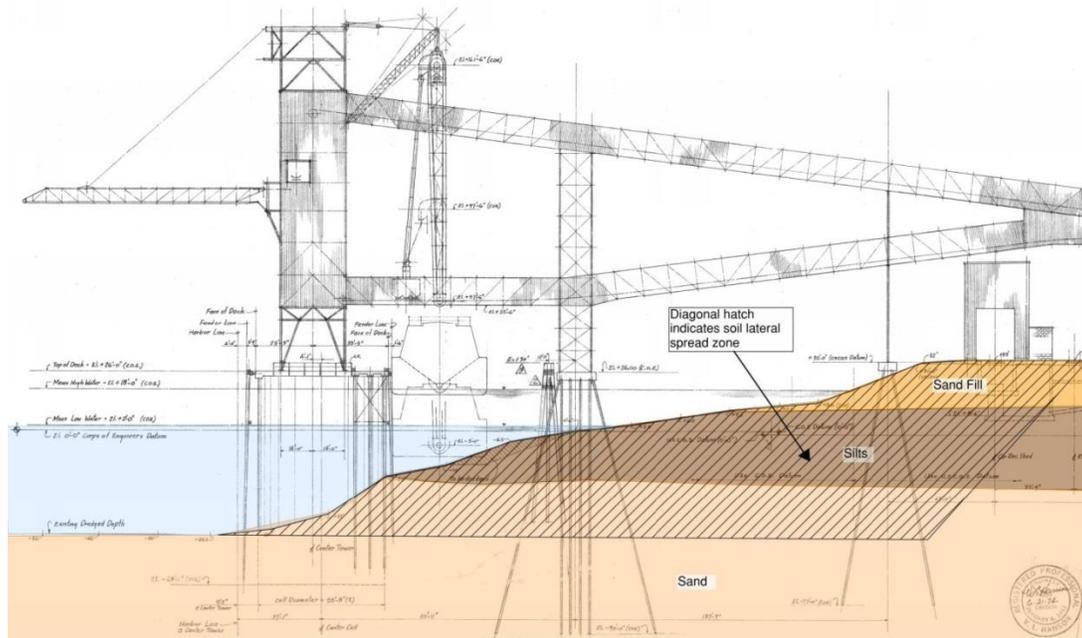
Berth 501 dock section indicating zone of soil lateral spreading
